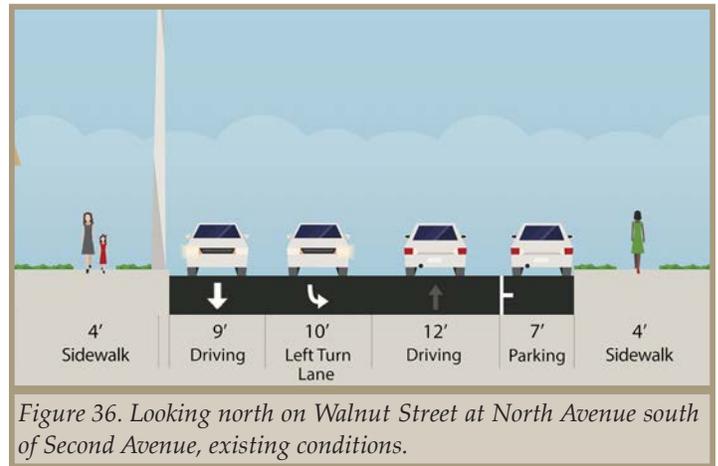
Looking north on Walnut Street at North Avenue south of Second Avenue, existing conditions.
